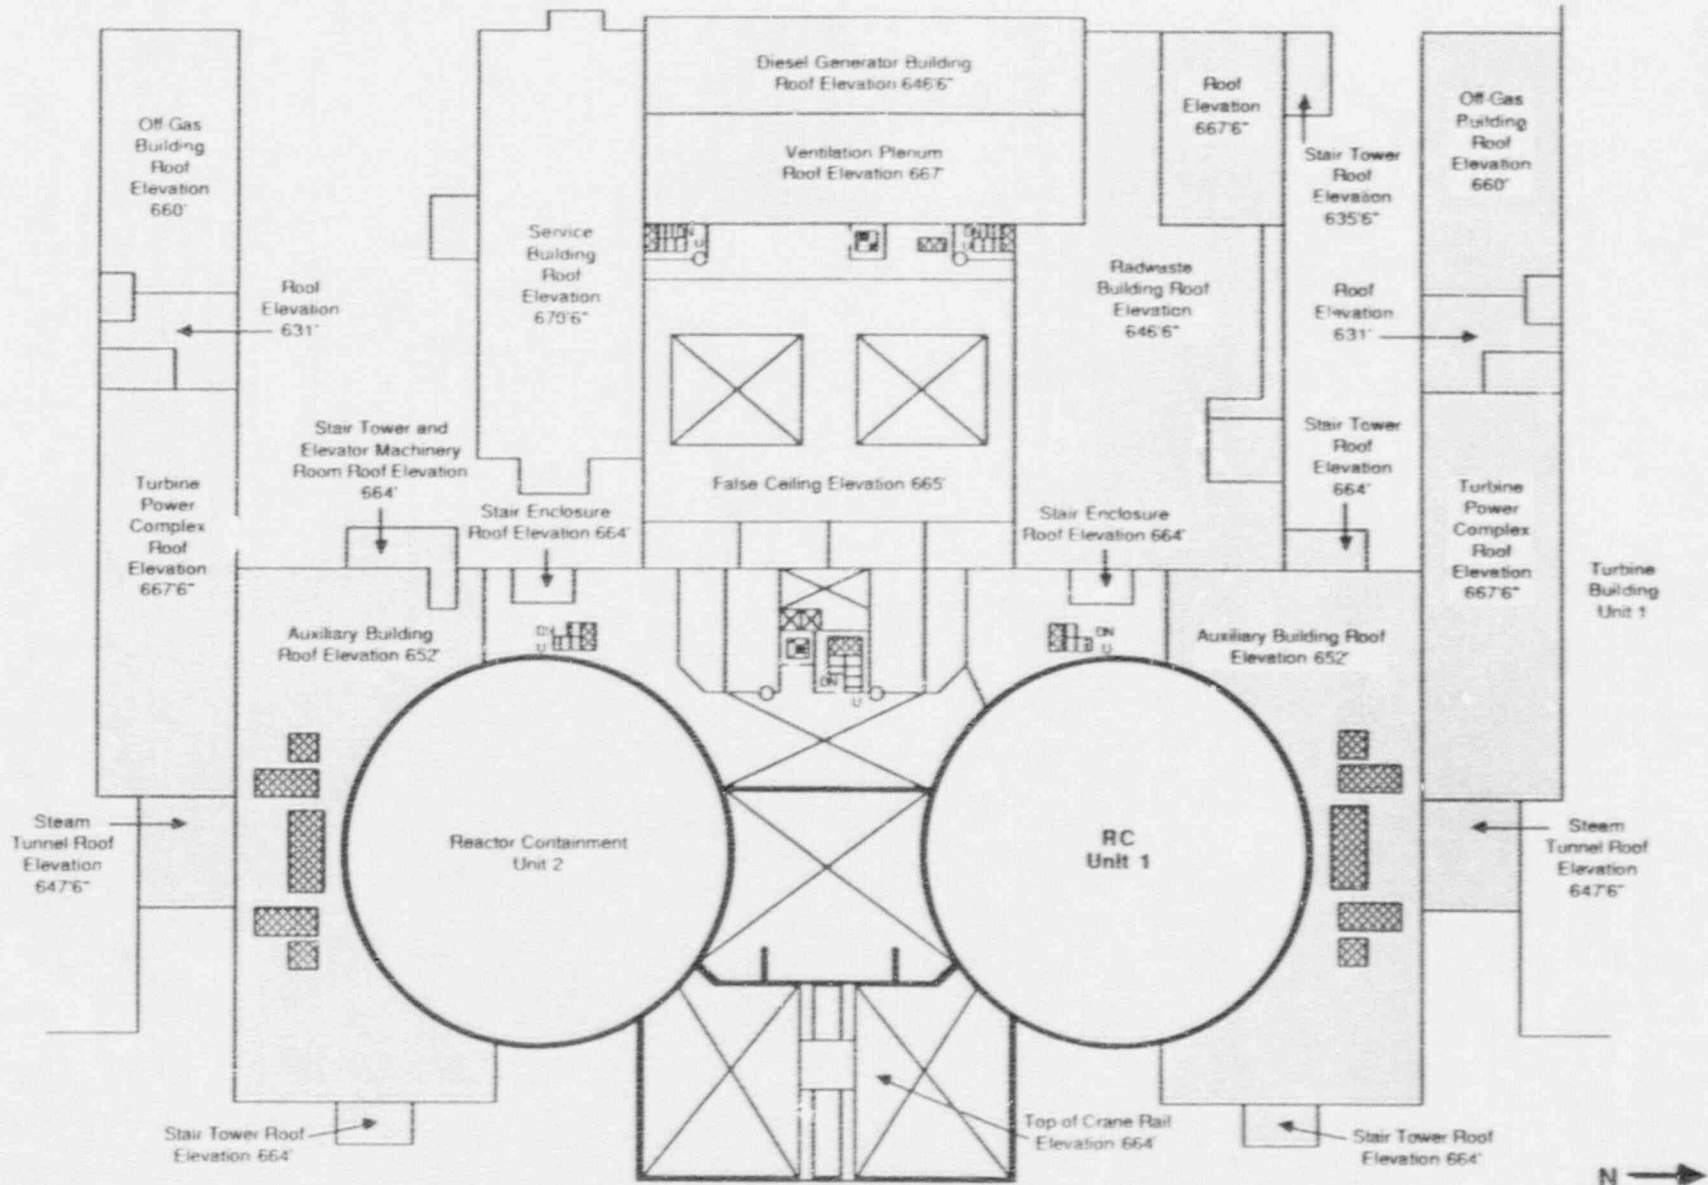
Perry 1 and 2 Reactor Building, Auxiliary Building, Intermediate Building, and Control Complex Elevation 664'
